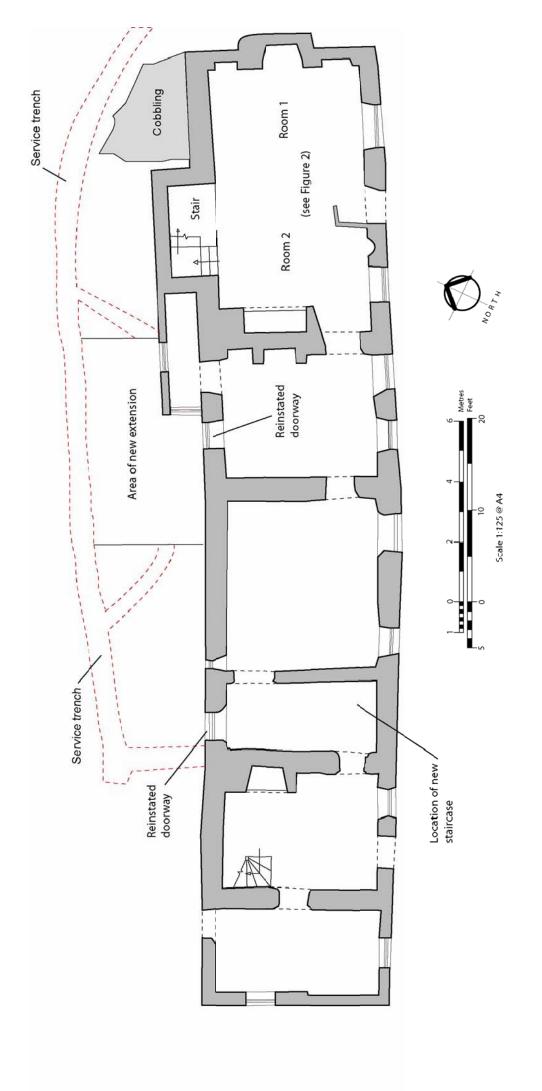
Plan of the house at Grudgeworthy showing the location of groundworks.
